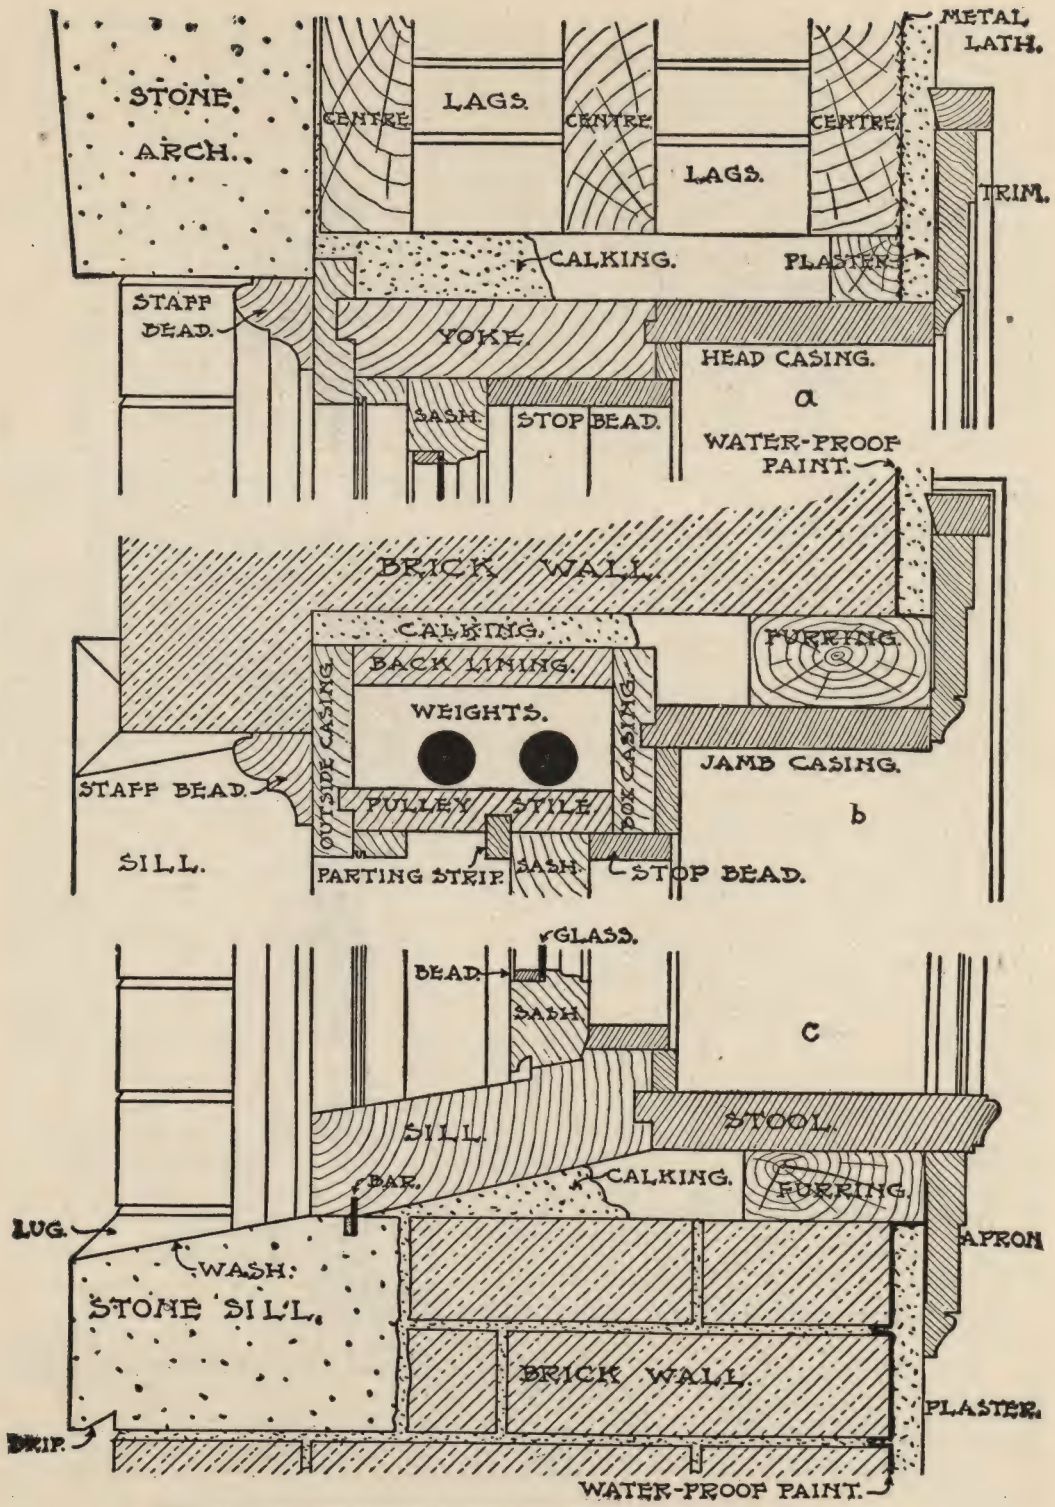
DOUBLE-HUNG WINDOW IN 18-INCH BRICK WALL.
